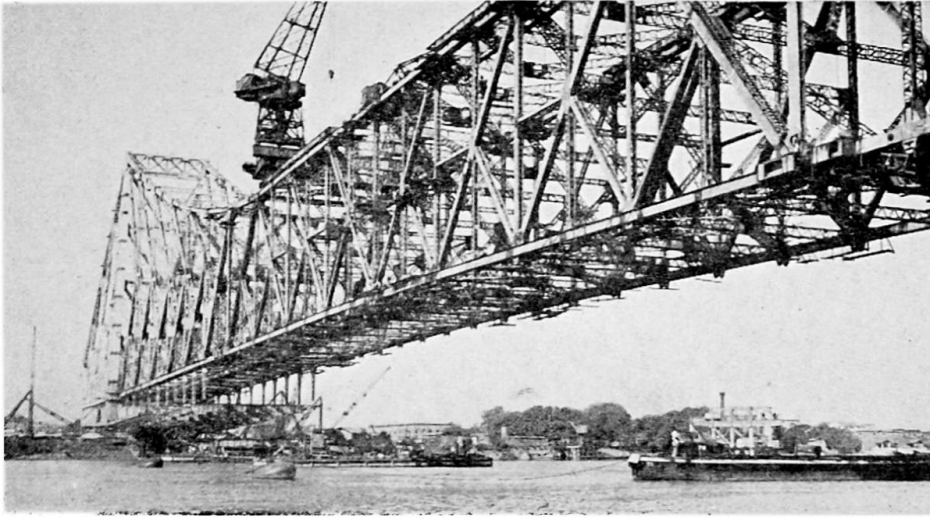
New Howrah Bridge, Calcutta. Junction of suspended span after erection as two cantilevers
